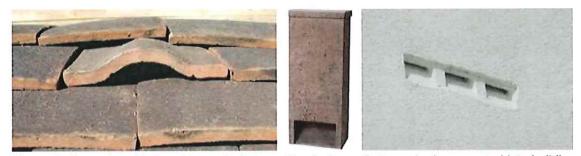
Examples of integral bespoke bat roosting features that may be incorporated into buildings during construction/renovation. From left to right: an example of bat access tile into loft space; the 2FR bat tube; and an example of 2FR bat tubes installed into a house wall in a series of three. Other brands and designs are available.
